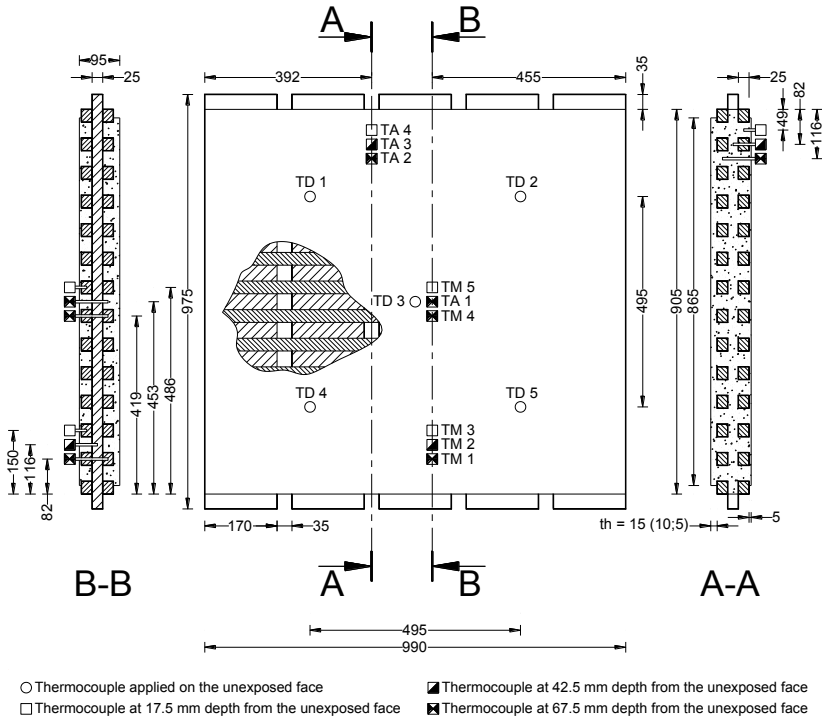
Panels geometry and thermocouples location (dimensions in mm)
